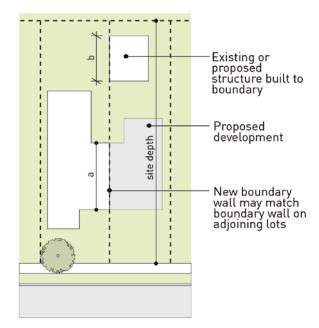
Maximum lengths allowed for built to boundary walls on lots between 10m and 12.5m wide
